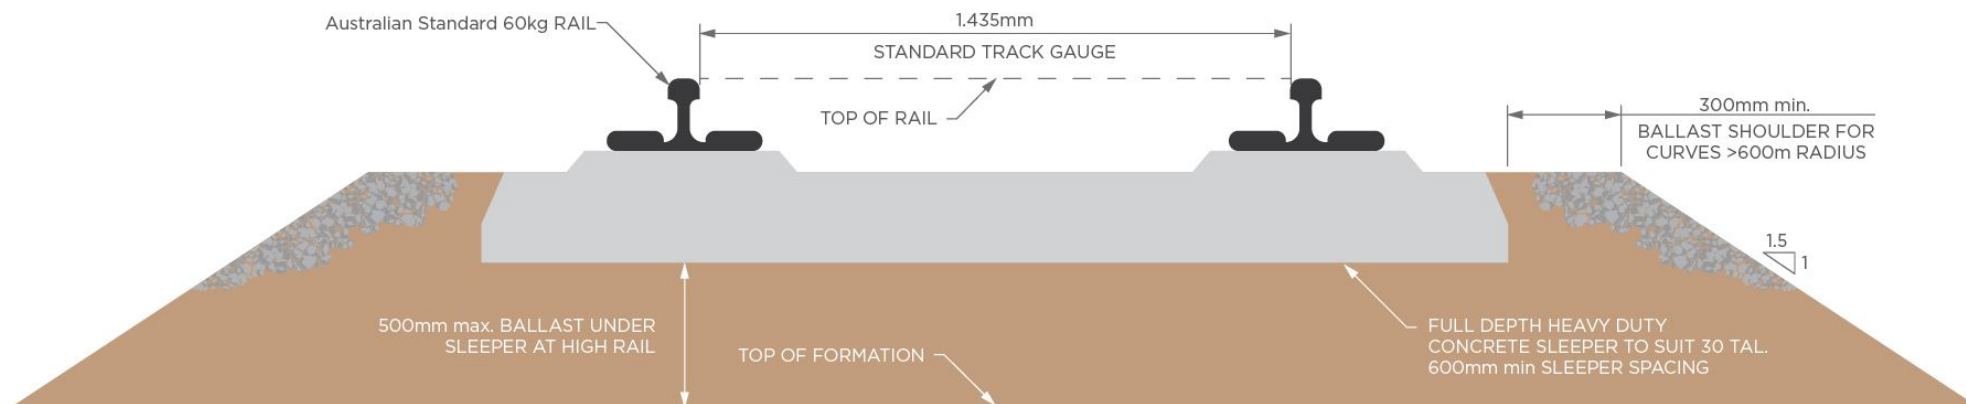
TYPICAL STANDARD-GAUGE BALLASTED TRACK CROSS-SECTION
